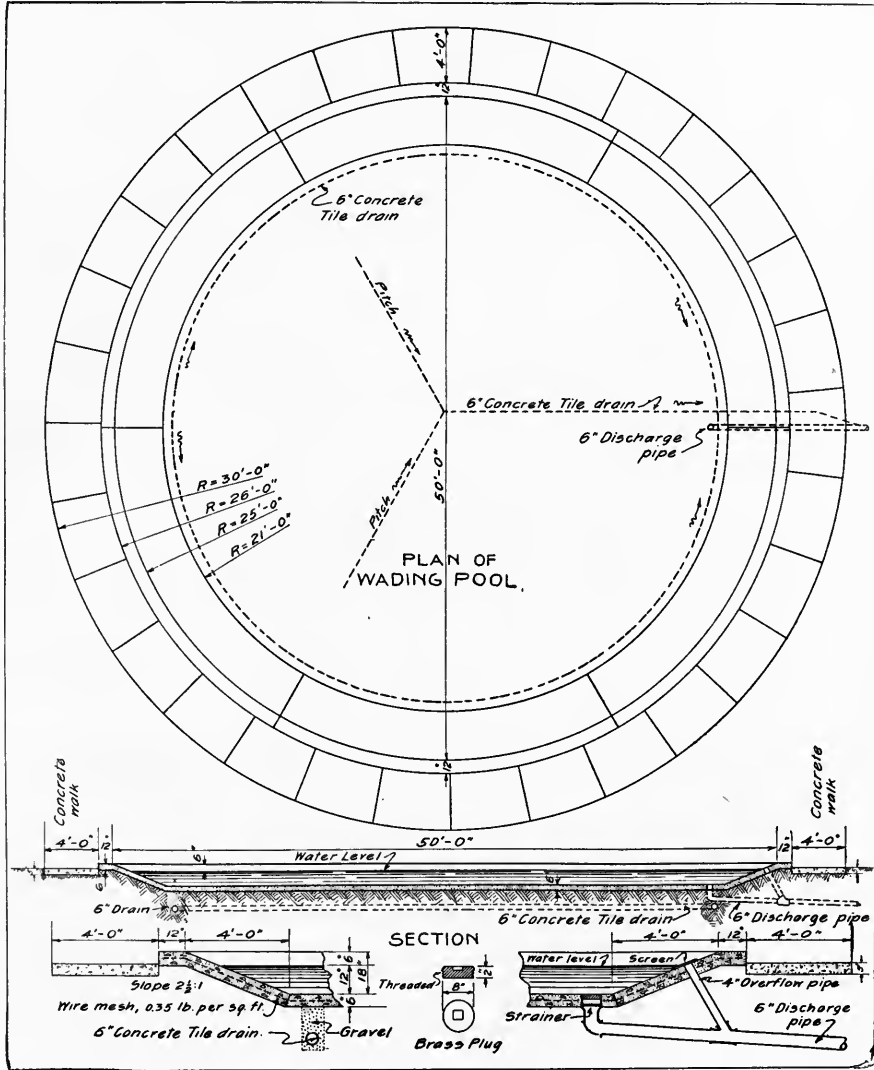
SUGGESTED DESIGN FOR CONCRETE WADING POOL
